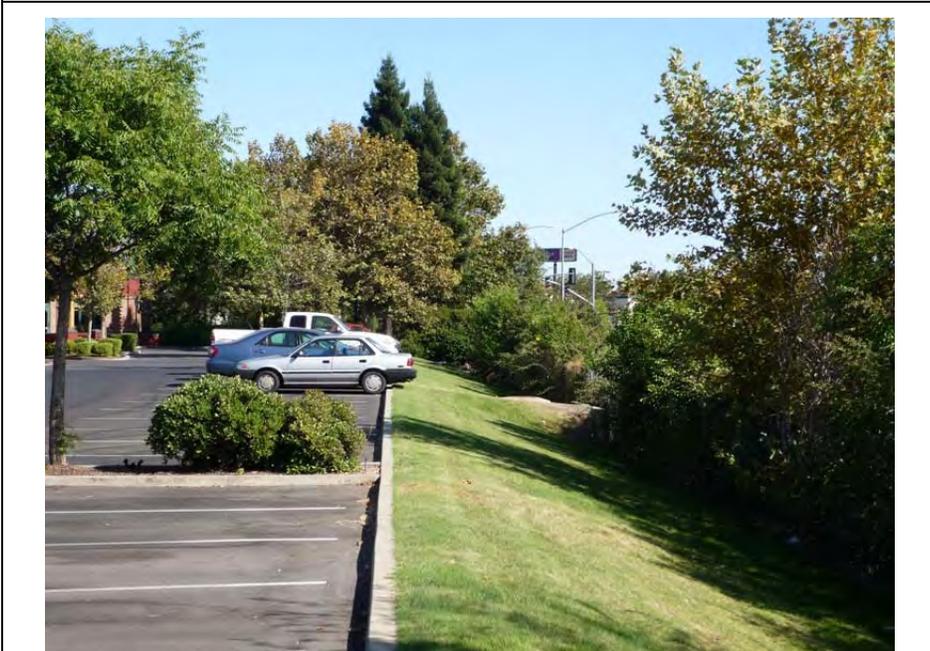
Extension of existing facilities adjacent to SR 99, along the East 20th Street northbound onramp; Class I proposed.
